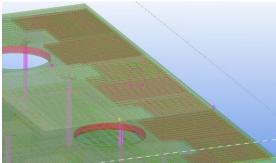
Outline of the hollow slab & reinforcement of the structural concrete.
